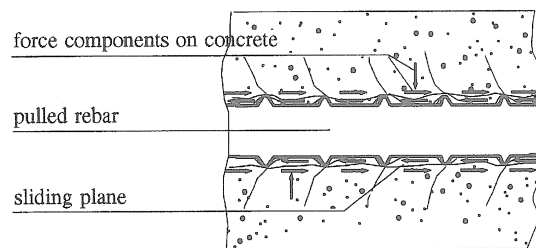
Deformations around the bar for pull-out bond failure.
